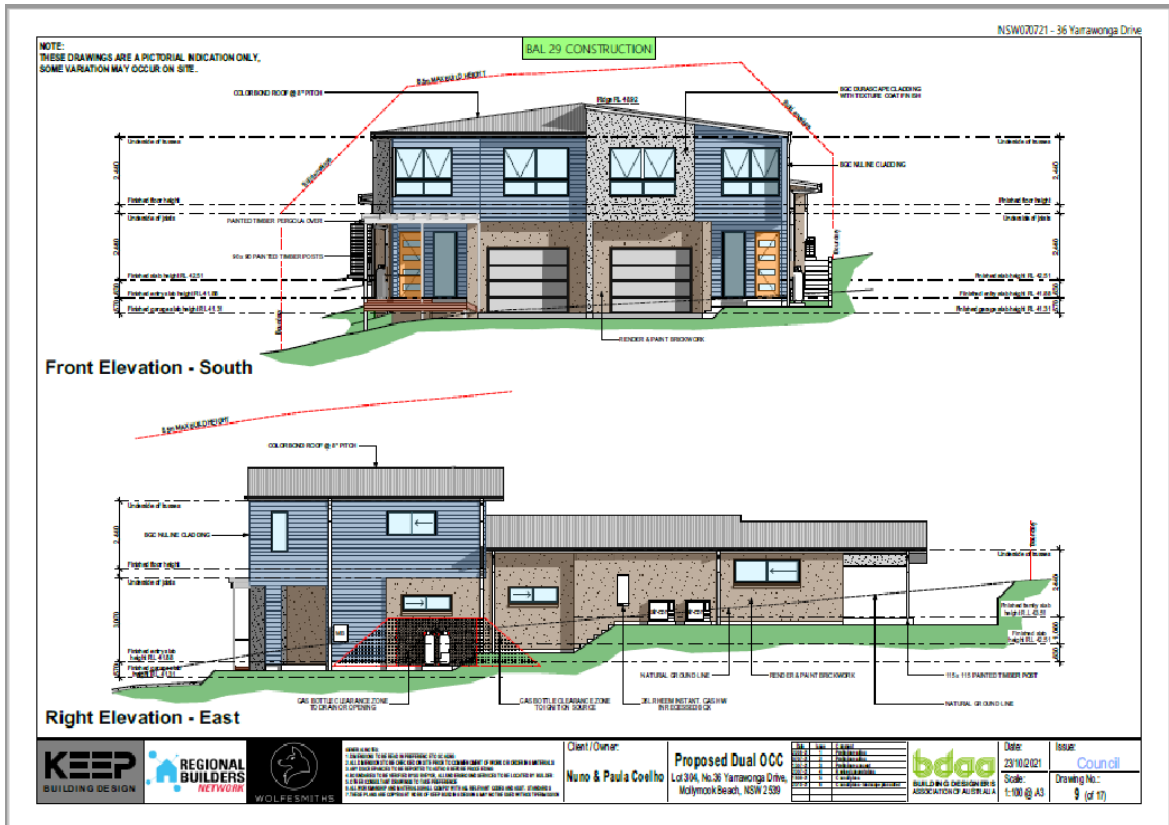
South & East Elevations - 36 Yarrowonga Dr Mollmook Beach
